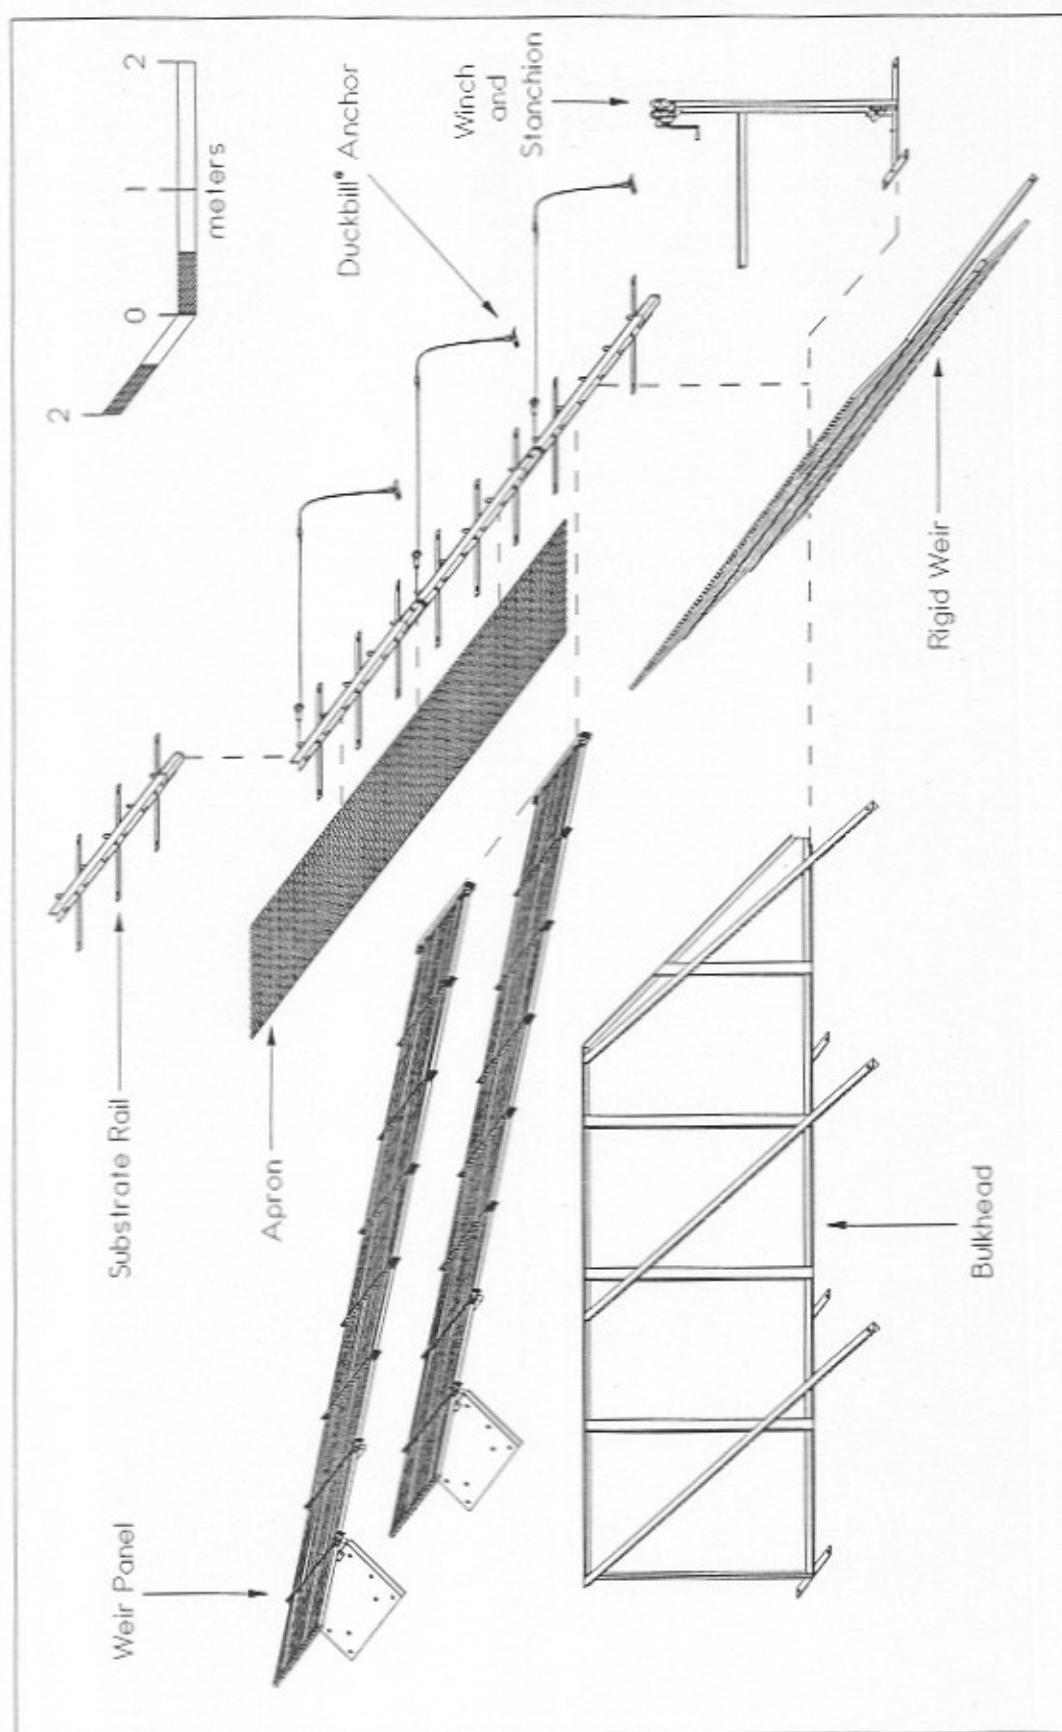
Exploded view showing the major components at the river-left section of weir.
